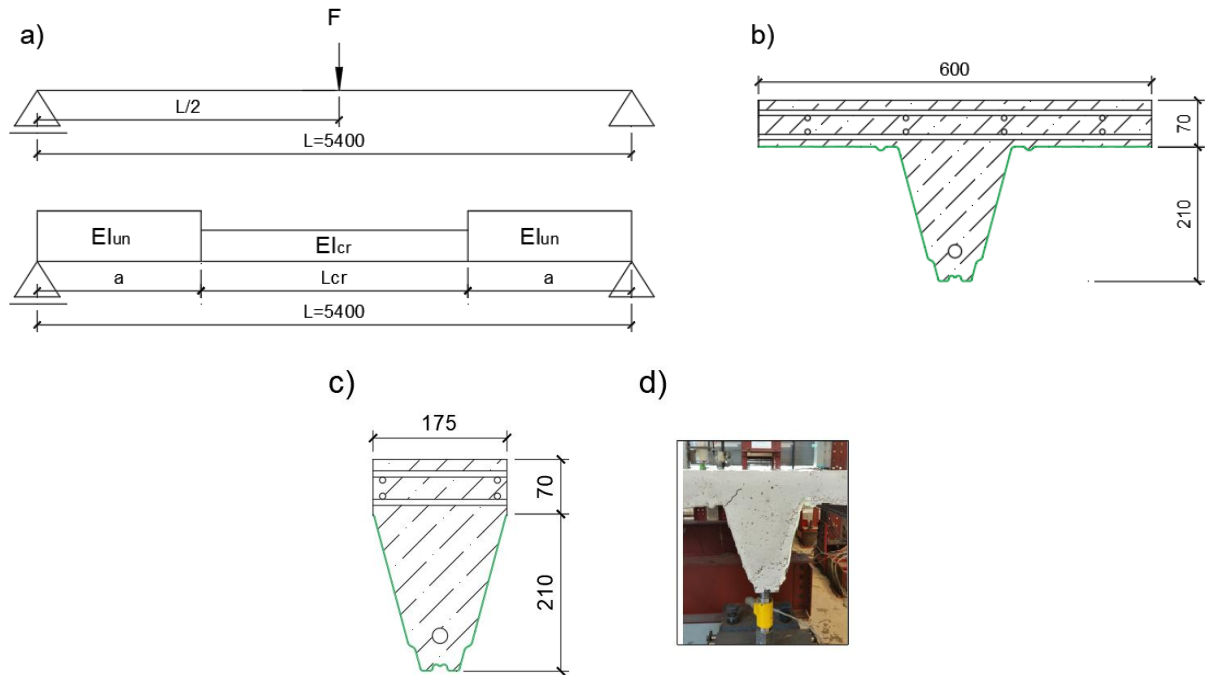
Beam geometry: a) load and varied bending stiffness along the beam; b) beam cross-section with 600mm width; c) beam cross-section with 175mm width; d) crack formation in a rib during testing (M. Dracht, 2015)
